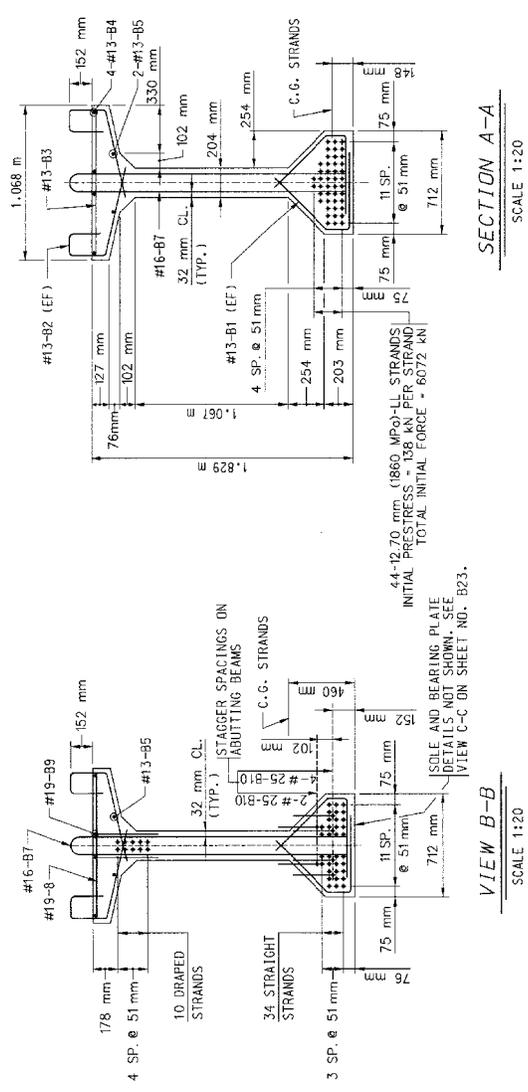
Beams B1 thru B12 Sections and Views (2/2)
